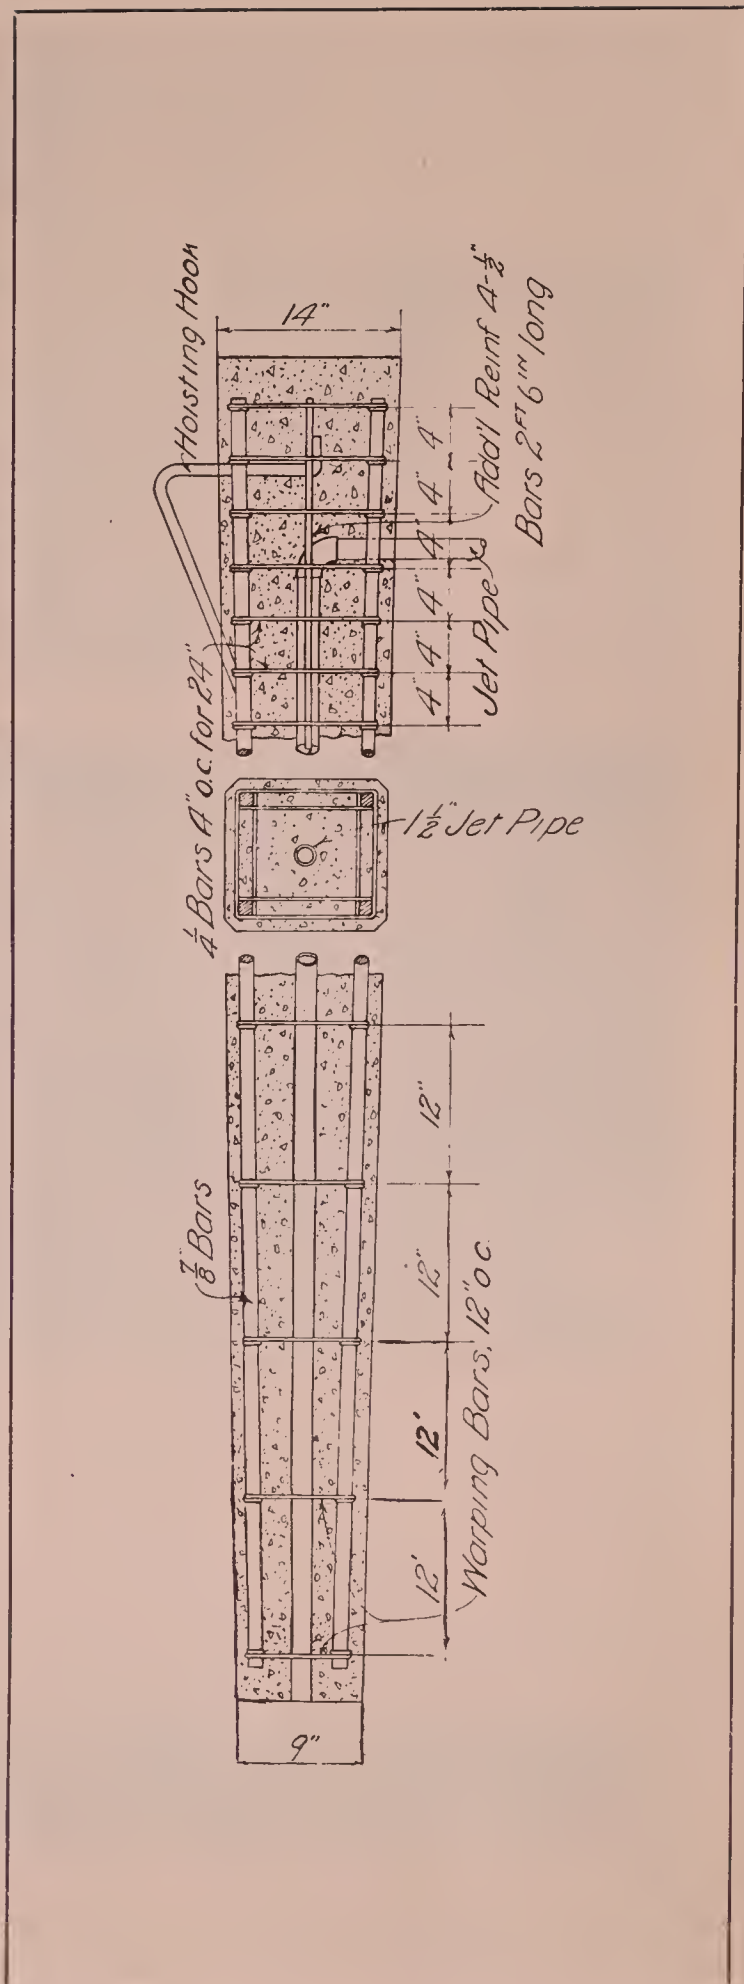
Detail of Reinforced Concrete Pile, Boston Woven Hose & Rubber Co.
